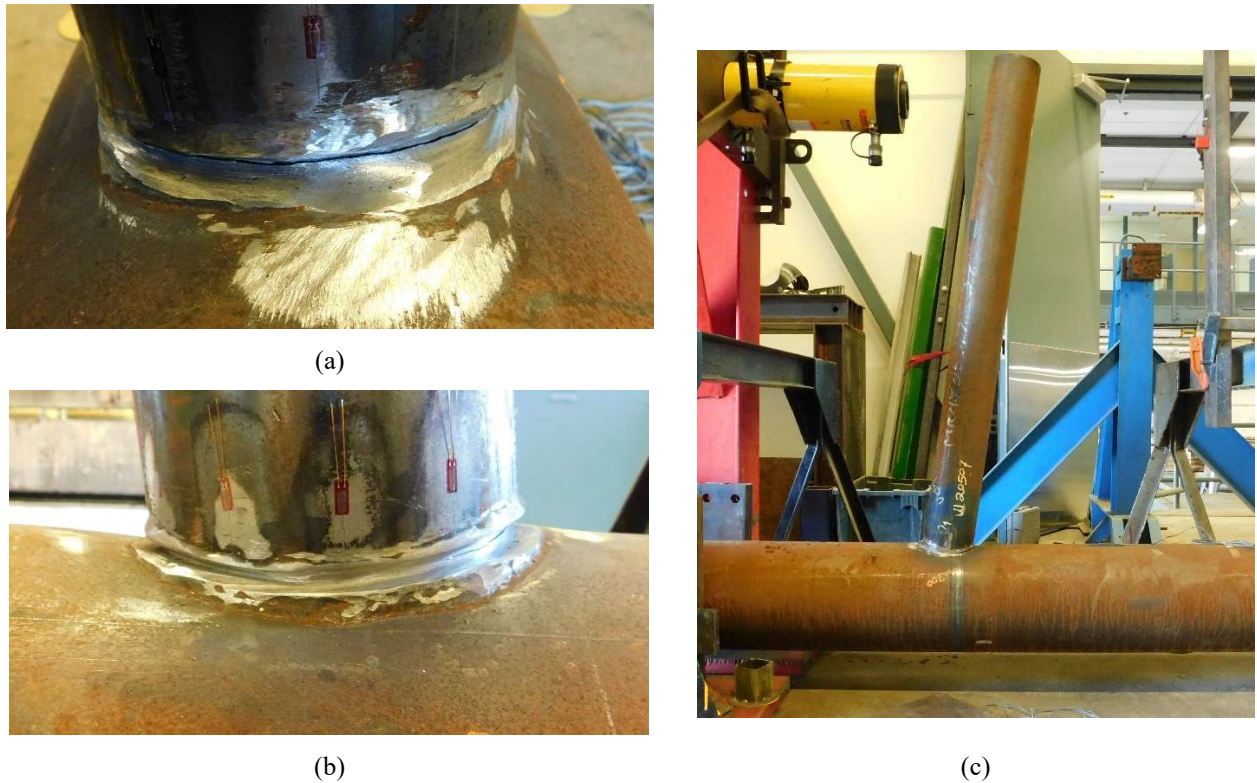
Failure of T273-127-1P (a) weld fracture, (b) chord deformation and (c) branch deformation
